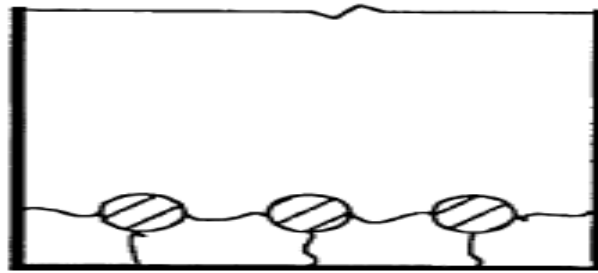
Radial splitting cracks towards concrete cover.
